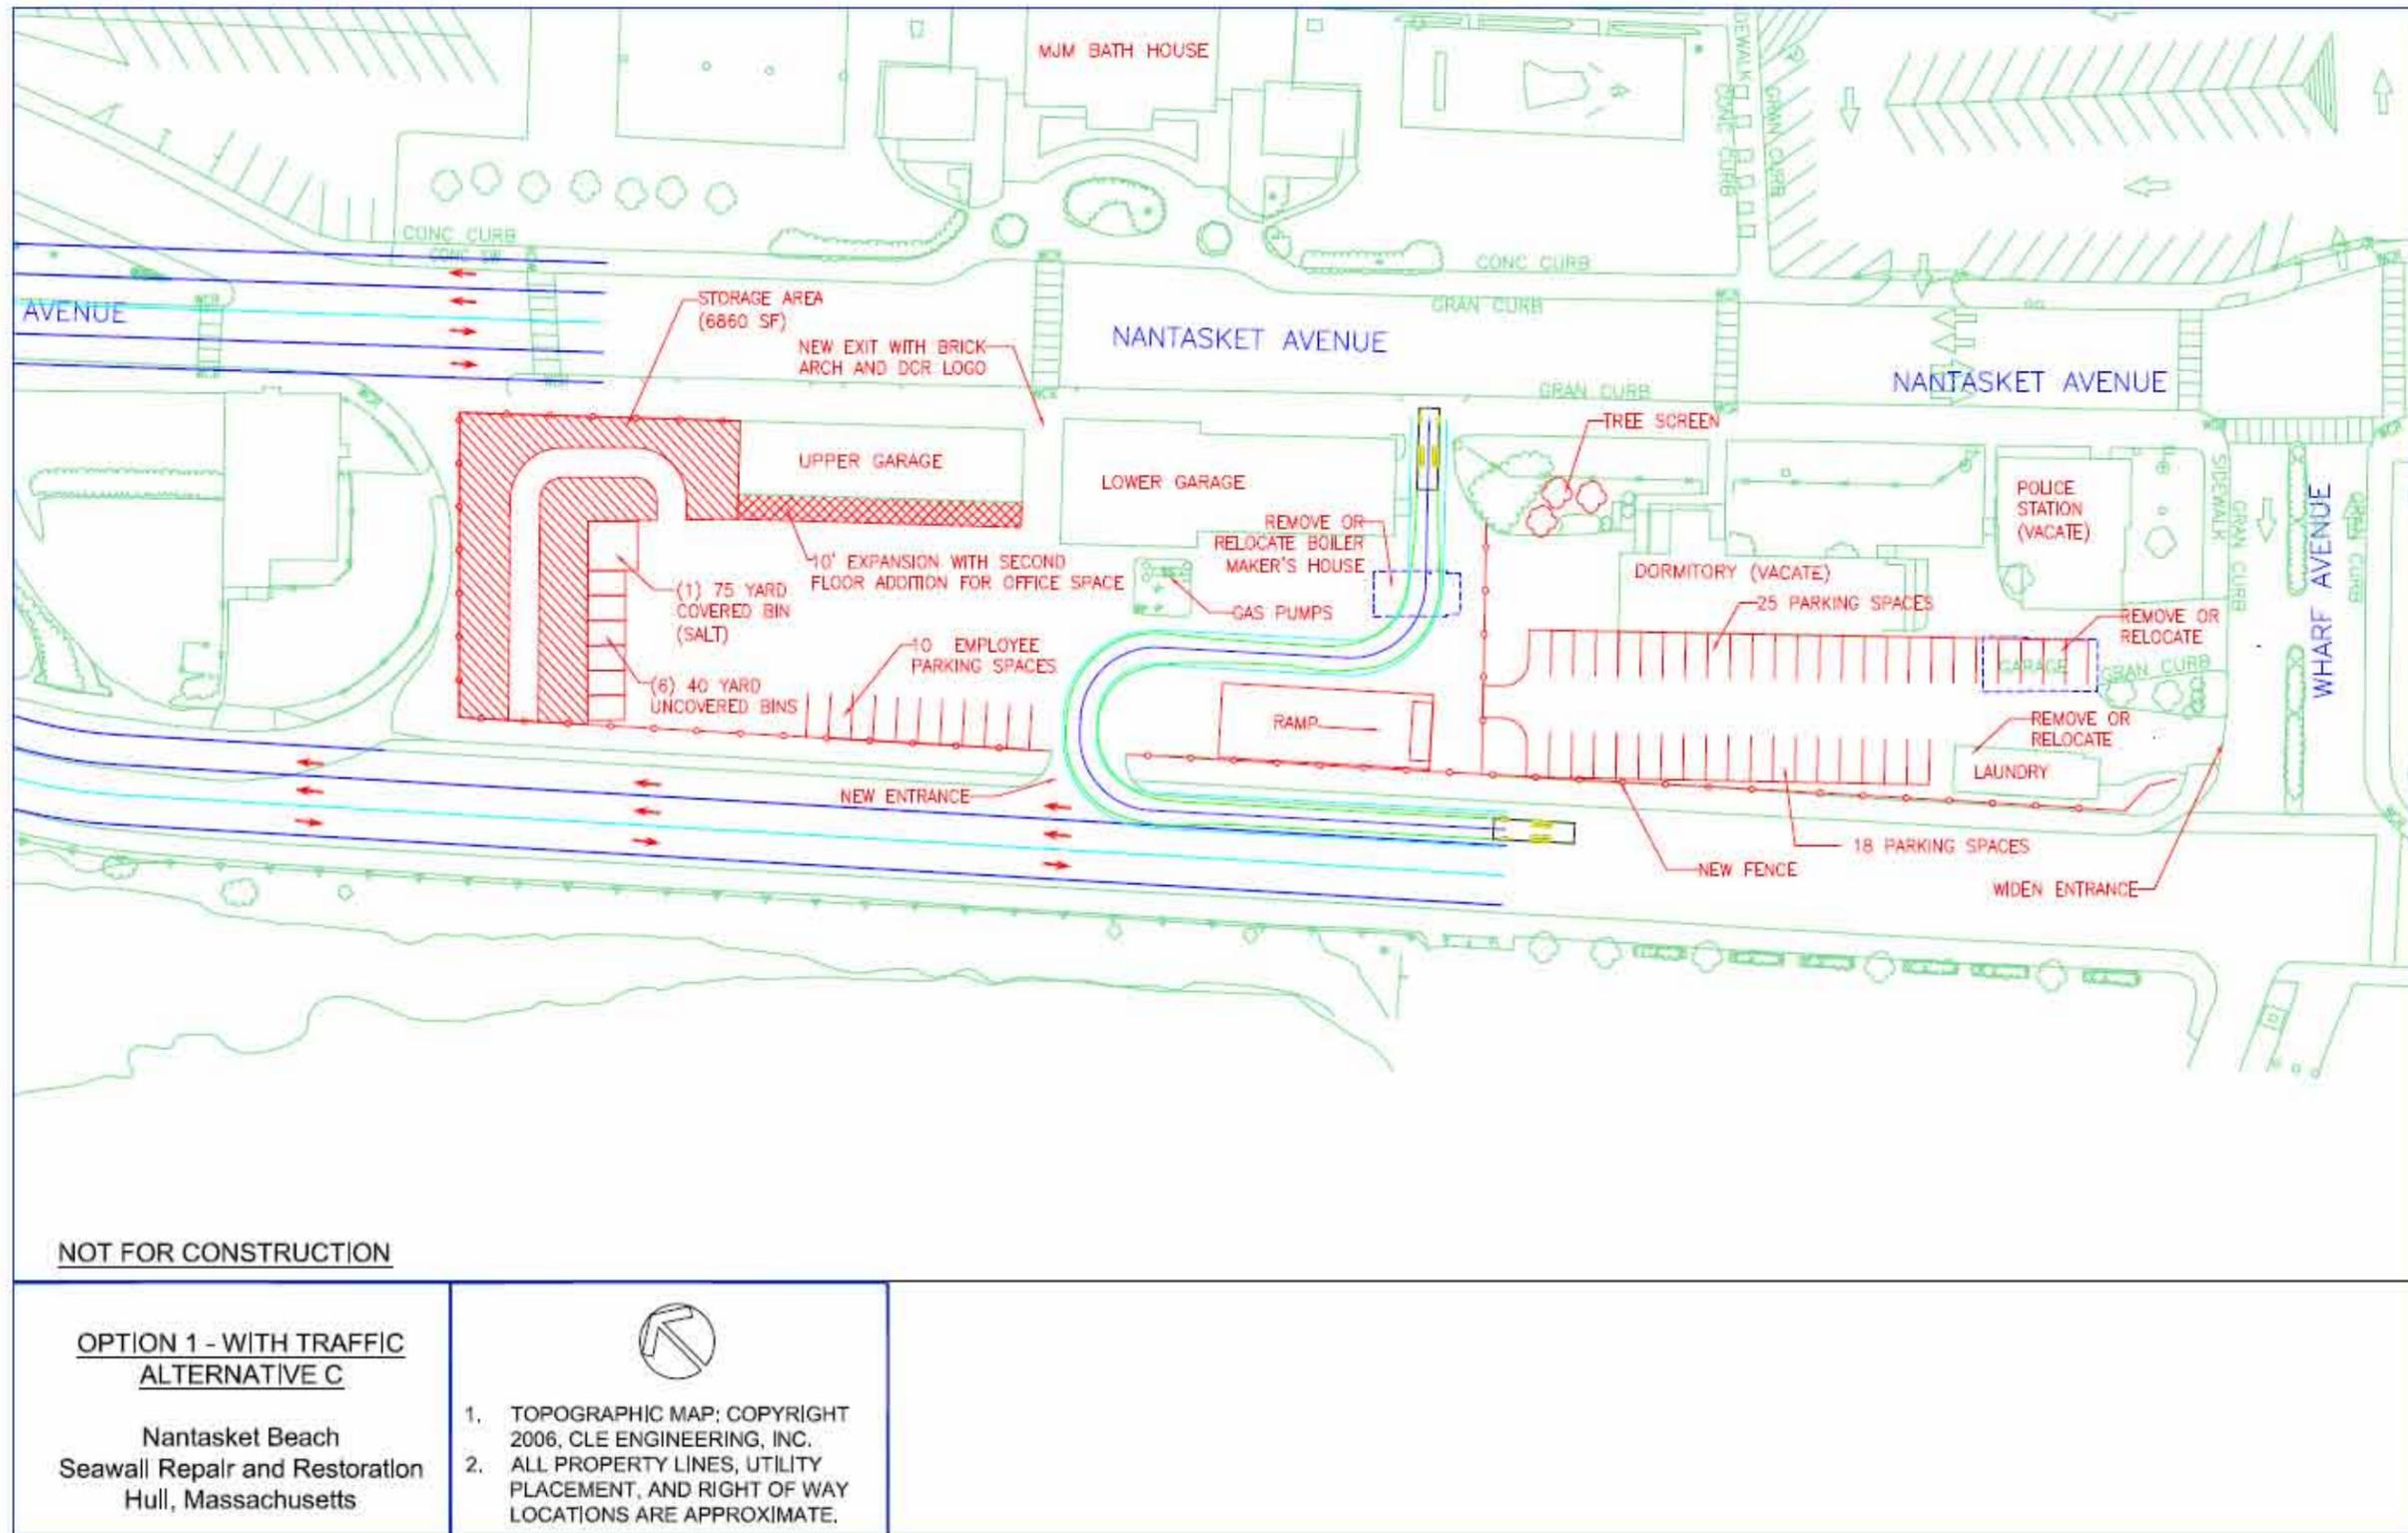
Facilities Layout Option 1 under Traffic Alternative C
